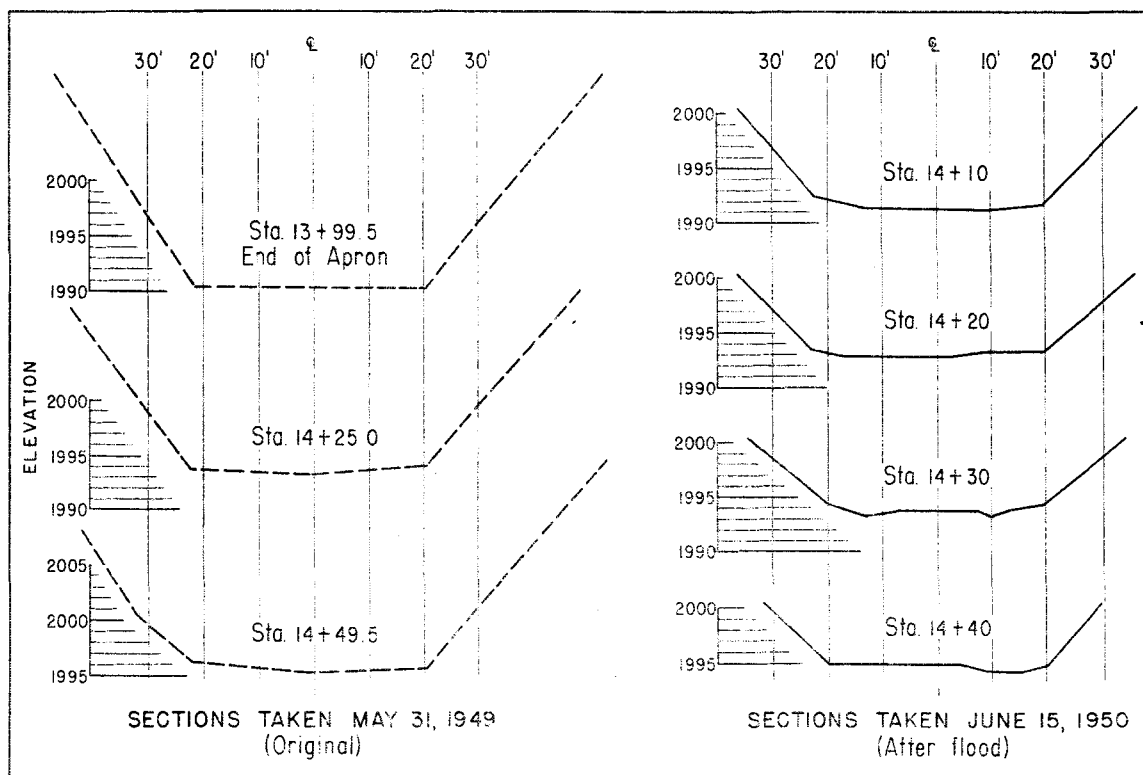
Detail cross sections showing before and after conditions in river channel below the stilling basin.
